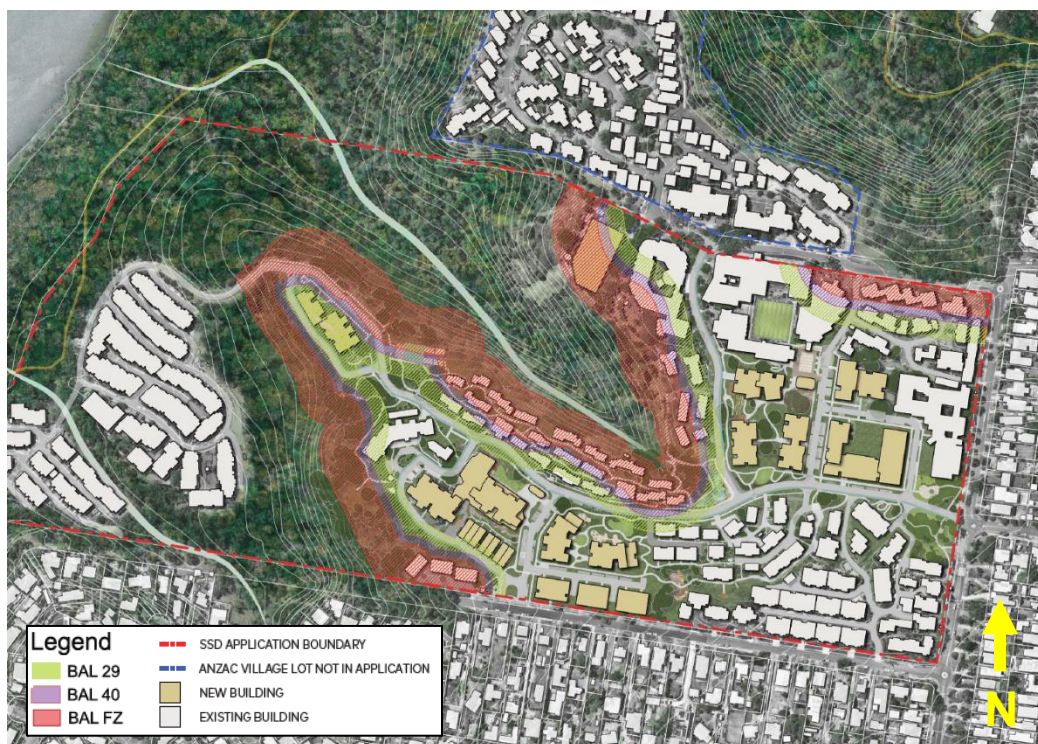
Area >19kW/m² which will be managed as an Asset Protection Zone
